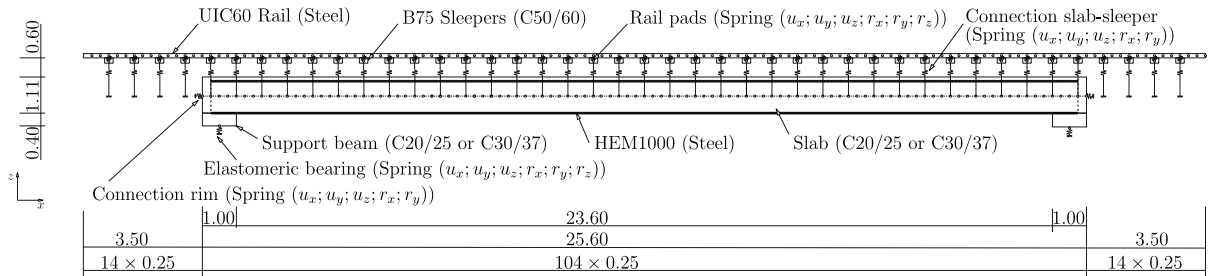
Longitudinal section of the simplified Erfttal bridge model.
